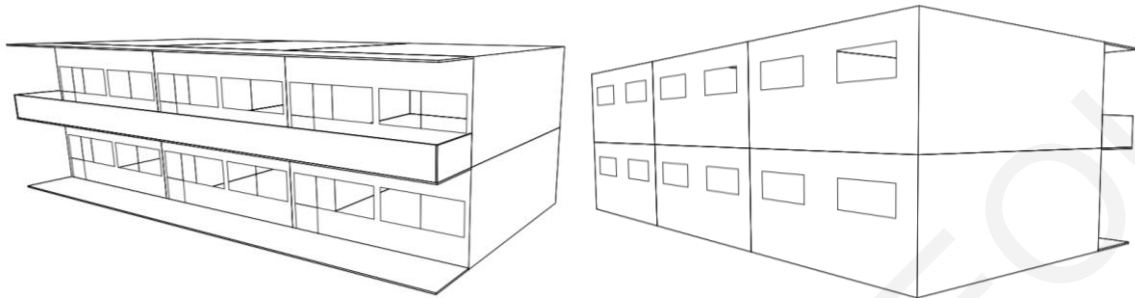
3D sketch of the facades (main openings and clerestories) of a typical school building element in IES-VE.
